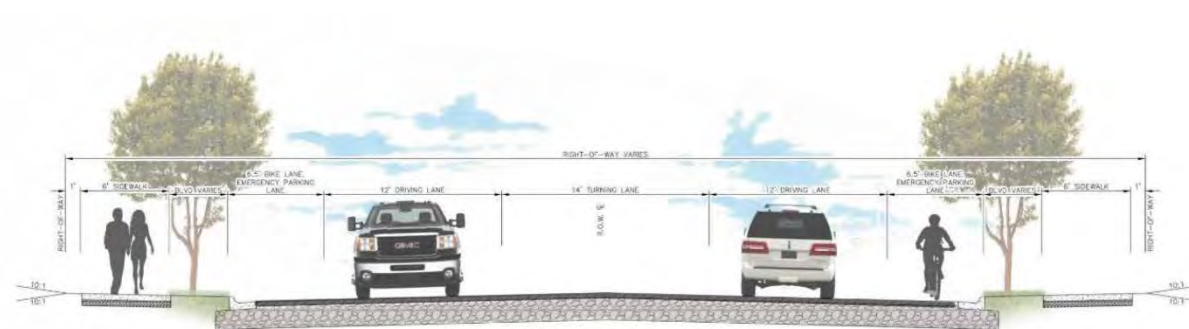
Street Section with bike and turn lanes (actual sections for Merrill Avenue and Towne Street may vary)
